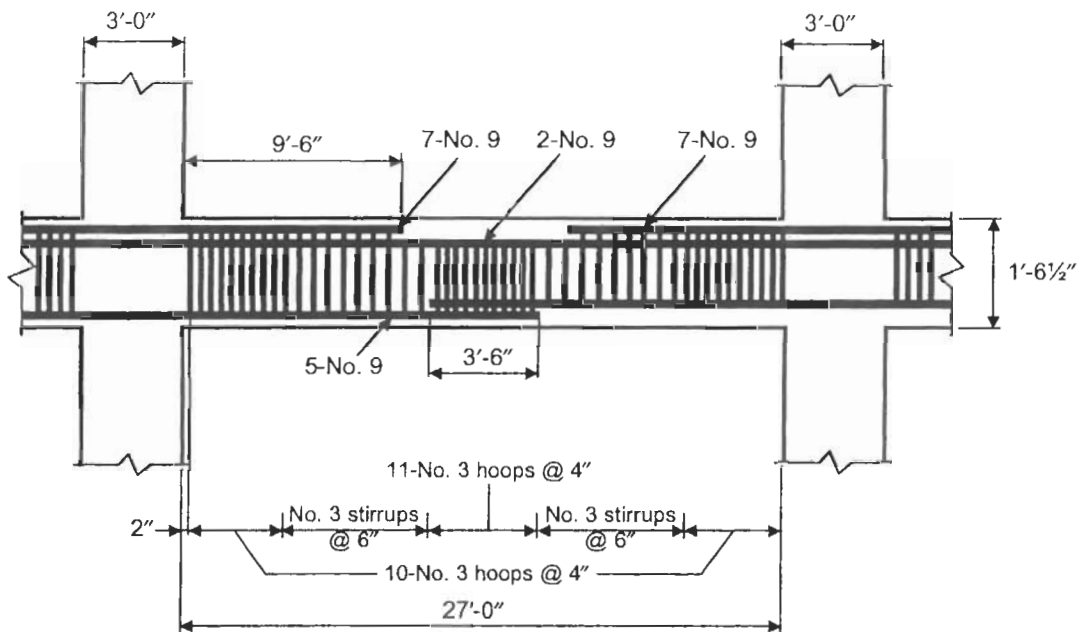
Reinforcement Details for Beam B3-C3 at Floor Level 1 (SDC D)
